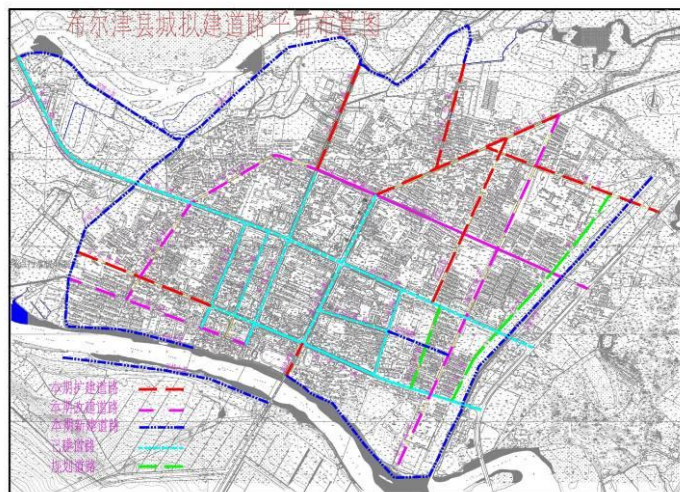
Layout plan of road reconstruction and expansion of the Burqin County town
